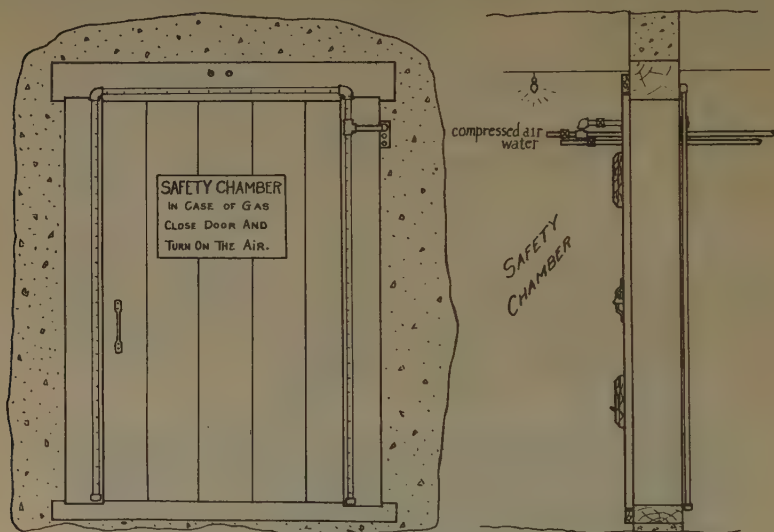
SAFETY CHAMBER DOOR, SHOWING PIPE ARRANGEMENT.
